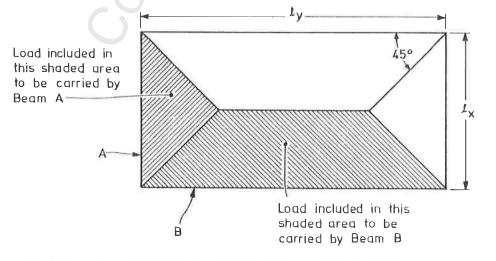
LOAD CARRIED BY SUPPORTING BEAMS OF UNIFORMLY LOADED PANELS
